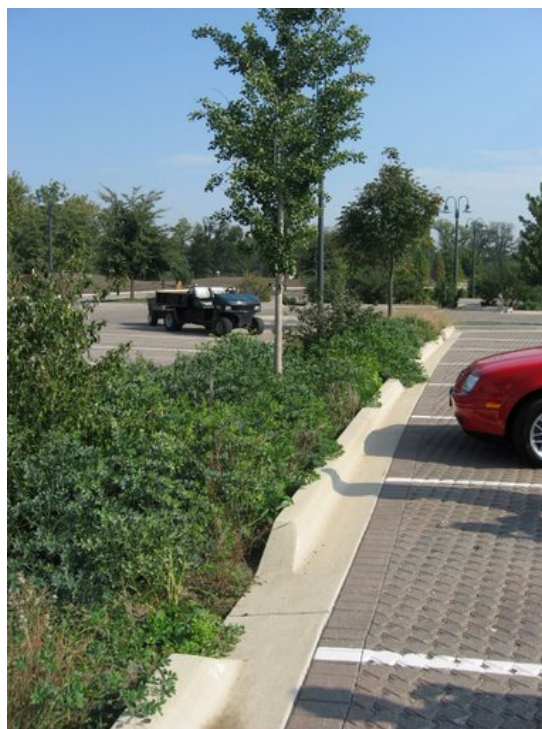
Parking lot bioswale and permeable pavers in Chicago.
